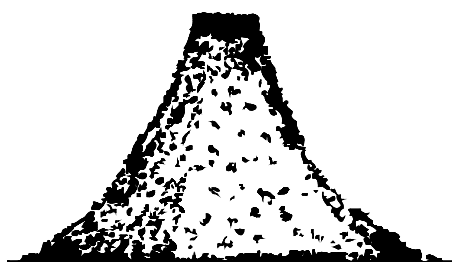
Aggregate moist; almost retains complete shape of metal mould
